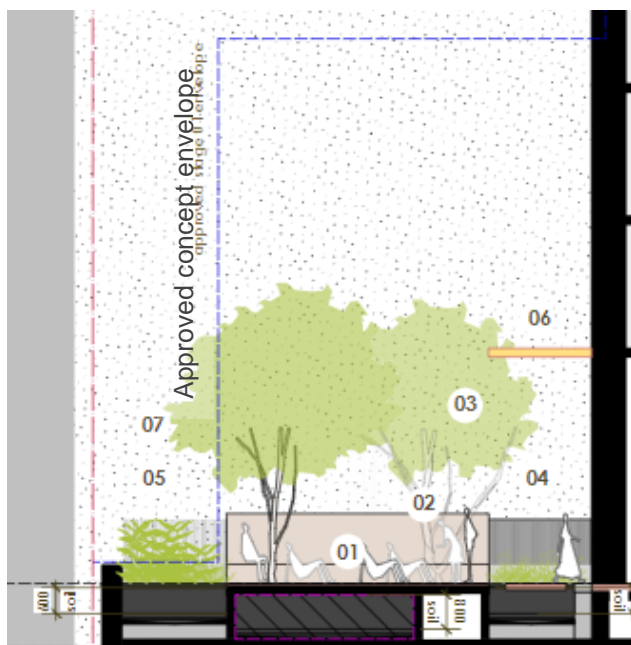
Level 06 Outdoor – Proposed in-accessible courtyard landscape design
